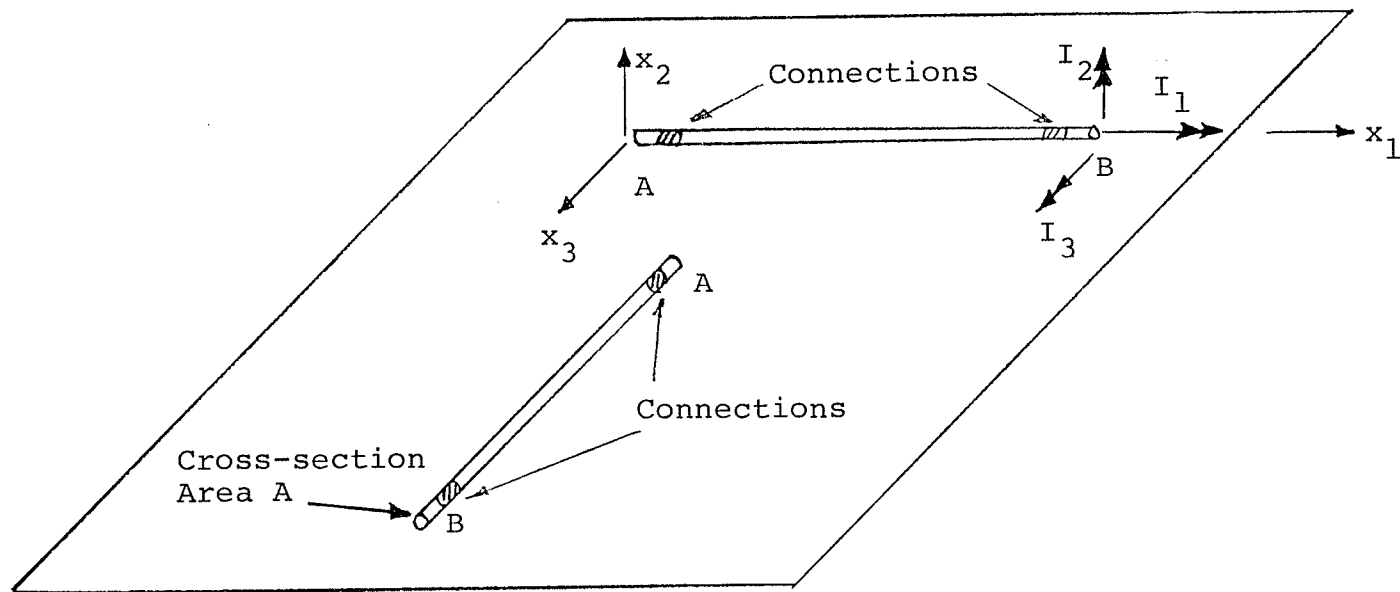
BEAM SECTION PROPERTIES IN A TYPICAL FLOOR
